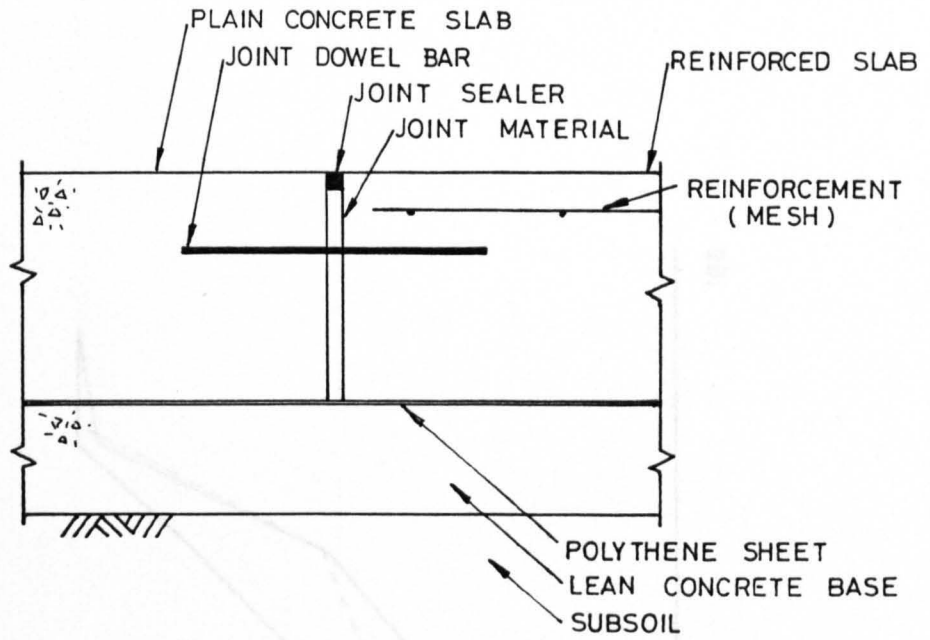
CROSS SECTION OF A FULL SCALE CONCRETE PAVEMENT (JOINT DETAILS)
